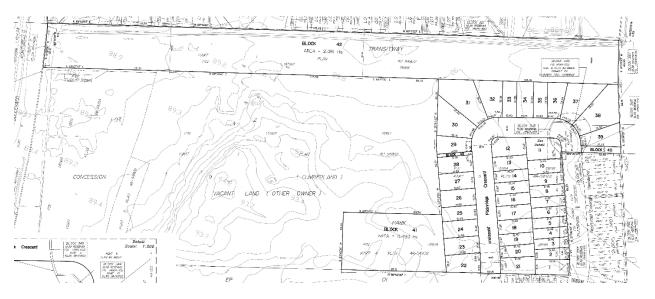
June 17, 2024 Draft Plan of Subdivision
